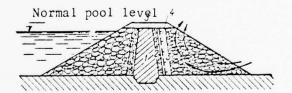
Heat-shielding layer in a thawed rockfill core dam. (1) Thawed core; (2) drainage system; (3) heat-shielding layer; (4) limit of maximum freezing of heat-shielding layer. Arrows show natural winter convection in the downstream shell.
